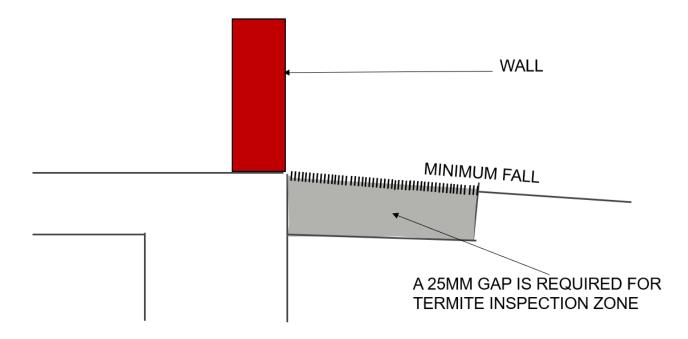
an access path that follows a wall - minimum termite inspection zone requirement.
